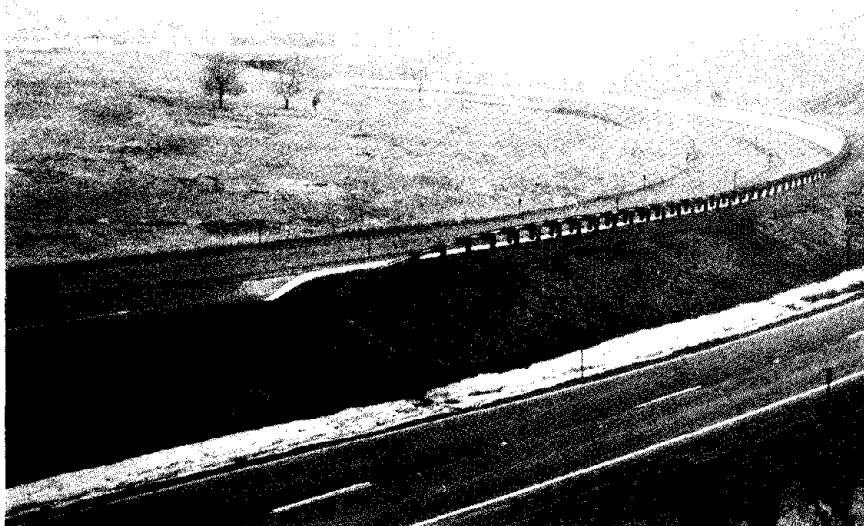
Concrete truck barrier along U.S. Route 95 in Lewiston, Idaho.
